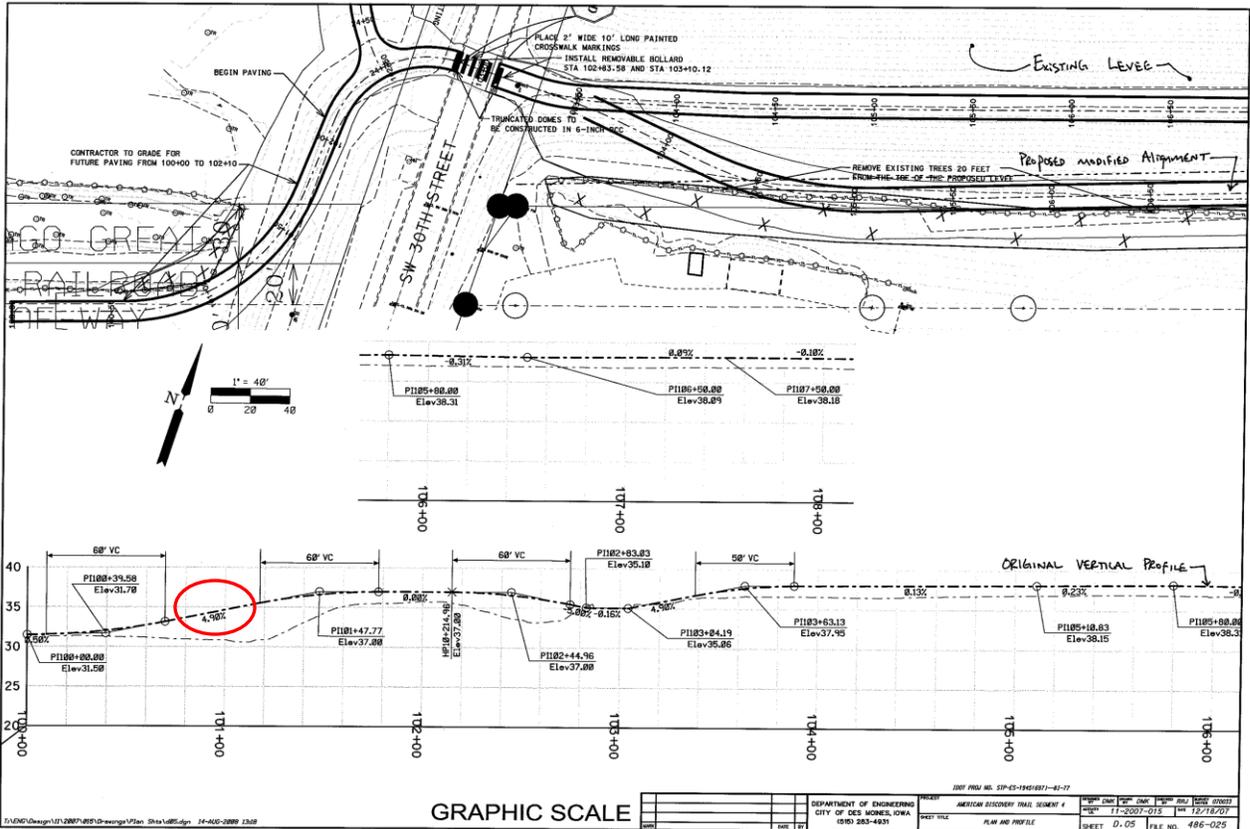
American Discovery Trail, Segment 4 Plan Sheet (12-18-2007)
